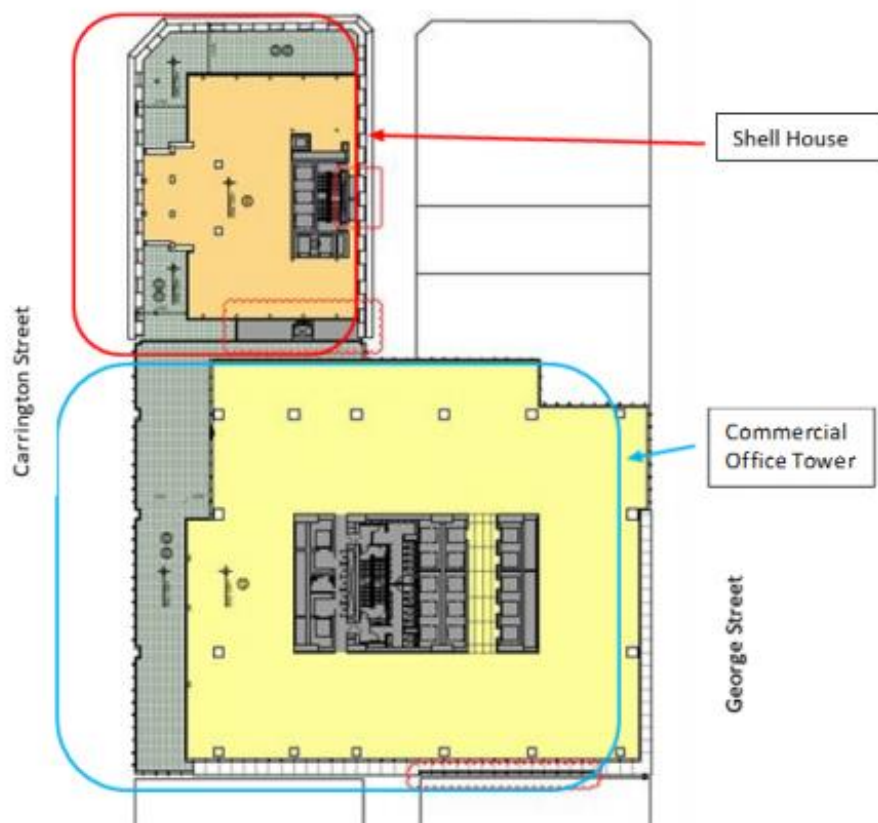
Stage 1 development of 'One Carrington St' - Shell House in context with tower at Wynyard Place (source: DPIE SSD 5824 Mod 8 Assessment Rpt)
